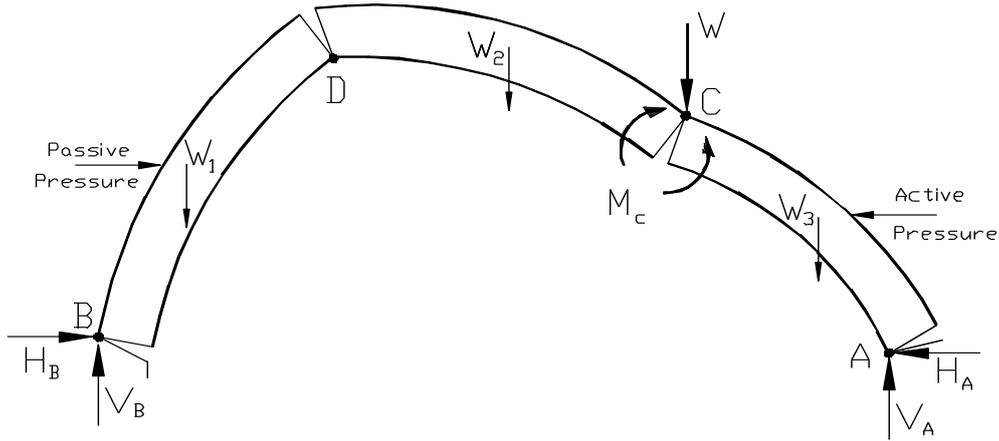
Forces on Barrel at Mechanism Failure for Reinforced Section
